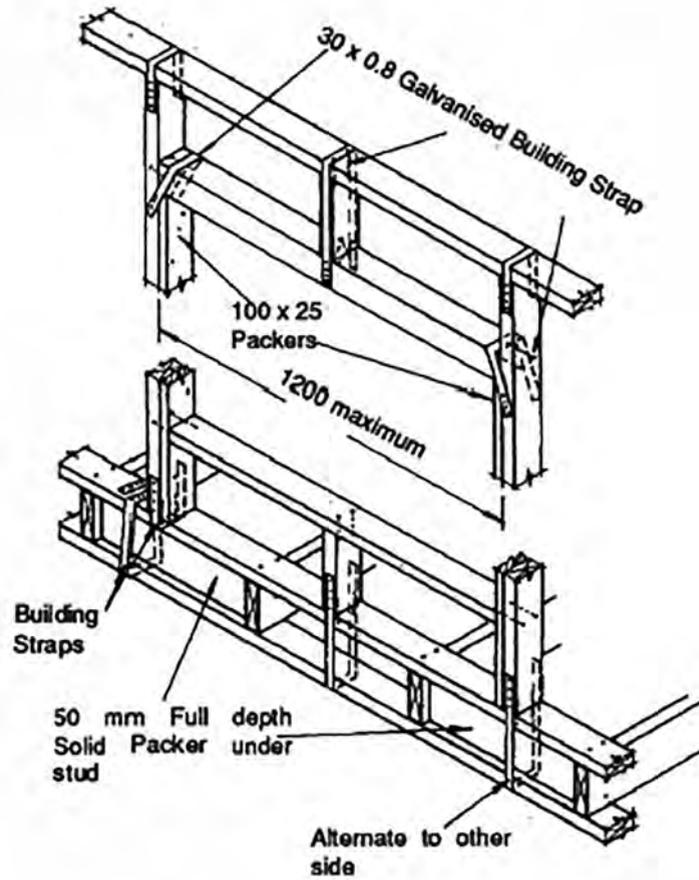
TIMBER LINTELS (SAWN) UP TO 1200 LINTEL SPAN
